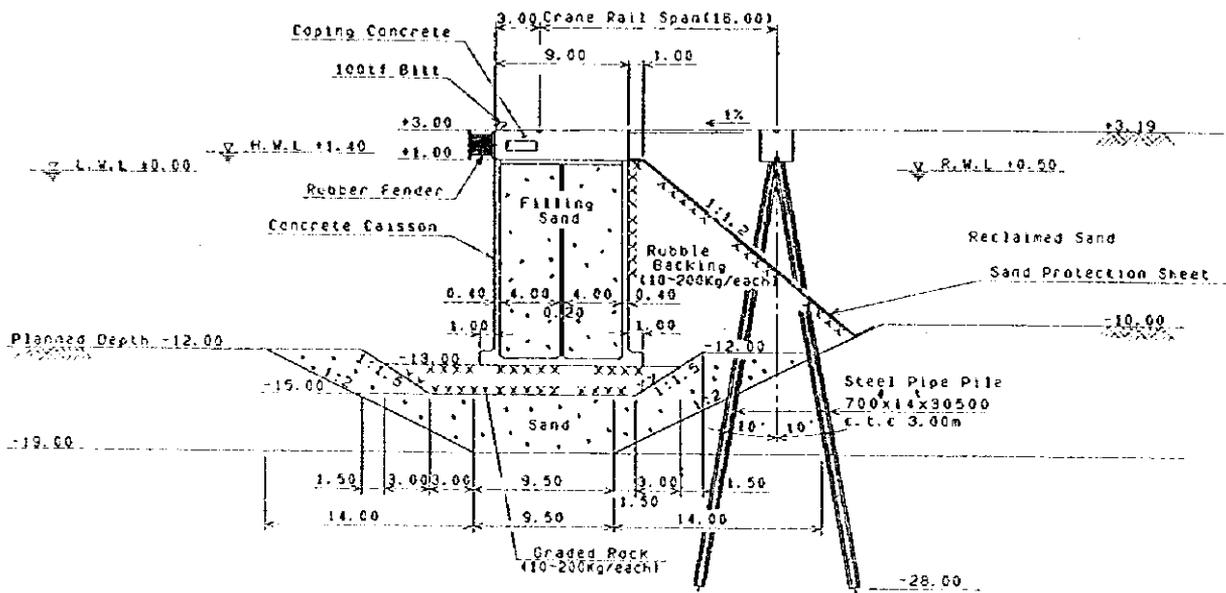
(2) Typical Cross Section of Quaywall E1 (RC Caisson)
